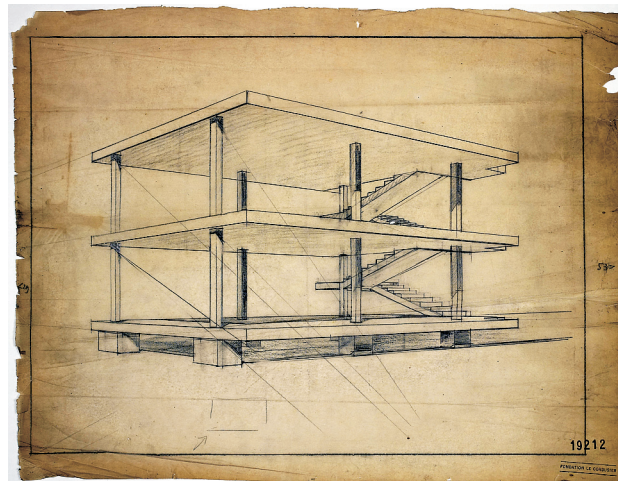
Reinforced concrete construction of the "Dom-ino" (1914) house – axonometric view; FLC 19212
